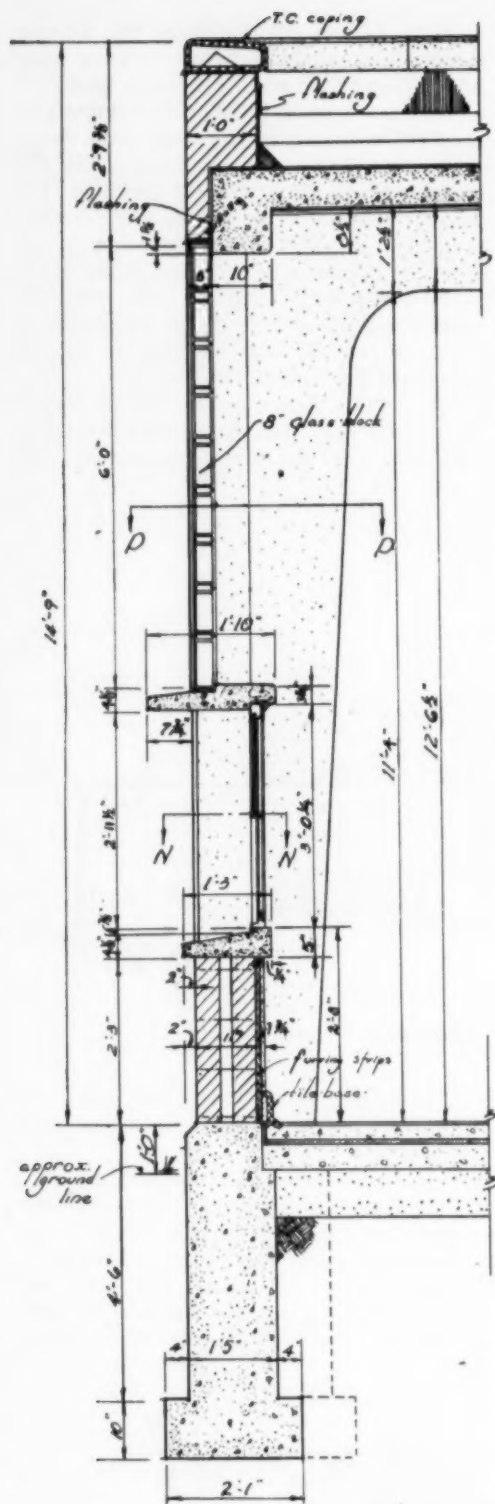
Cross-section of the window wall showing use of prismatic glass block.
